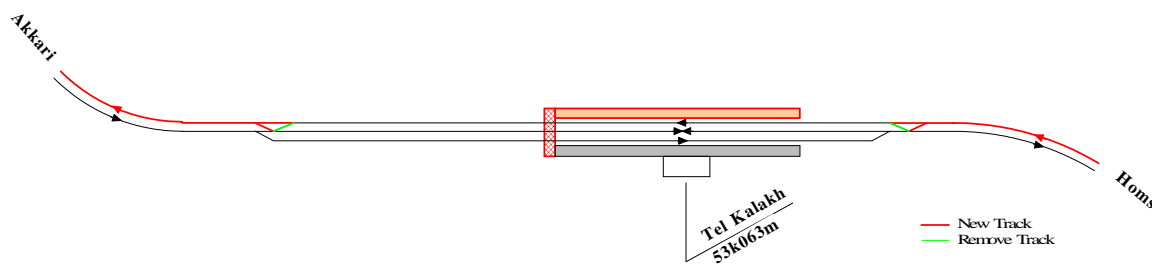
Sketch of Tel Kalaakh station track layout
